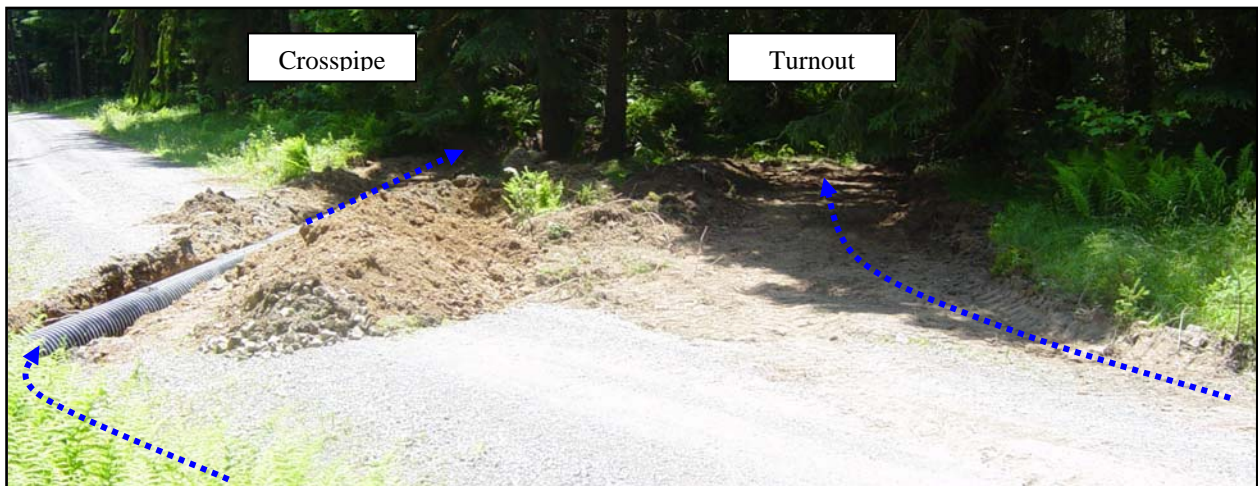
This photo from Potter County shows both a crosspipe and turnout being installed. The blue arrows indicate drainage flow. The turnout outlets water from the down-slope road ditch while the crosspipe (being installed in photo) outlets water under the road from the uphill road ditch.
